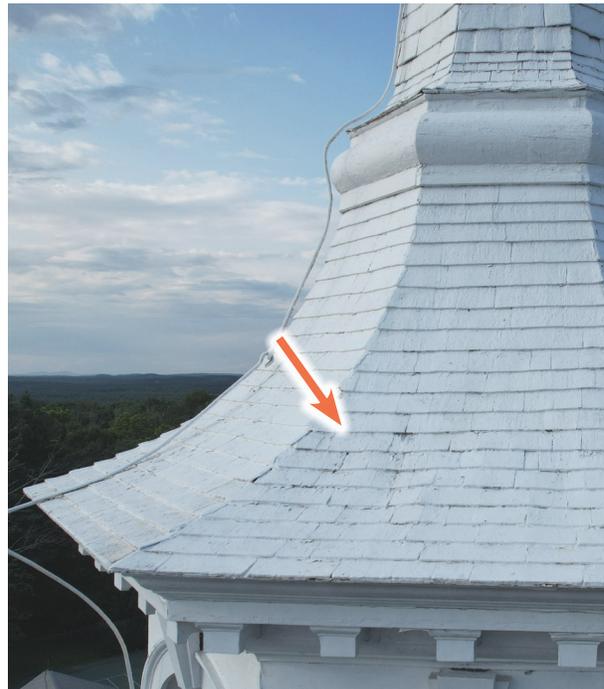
View of the warped, cracked, deteriorated wood shingles at the spire eaves. Note the undulation of the shingles.
